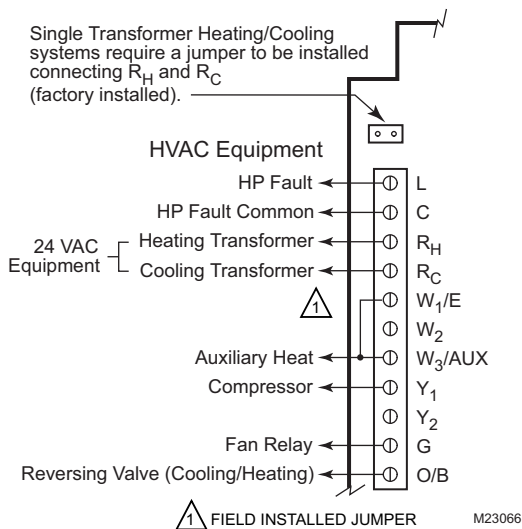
Wiring single-stage heat pump with Auxiliary Heat.
